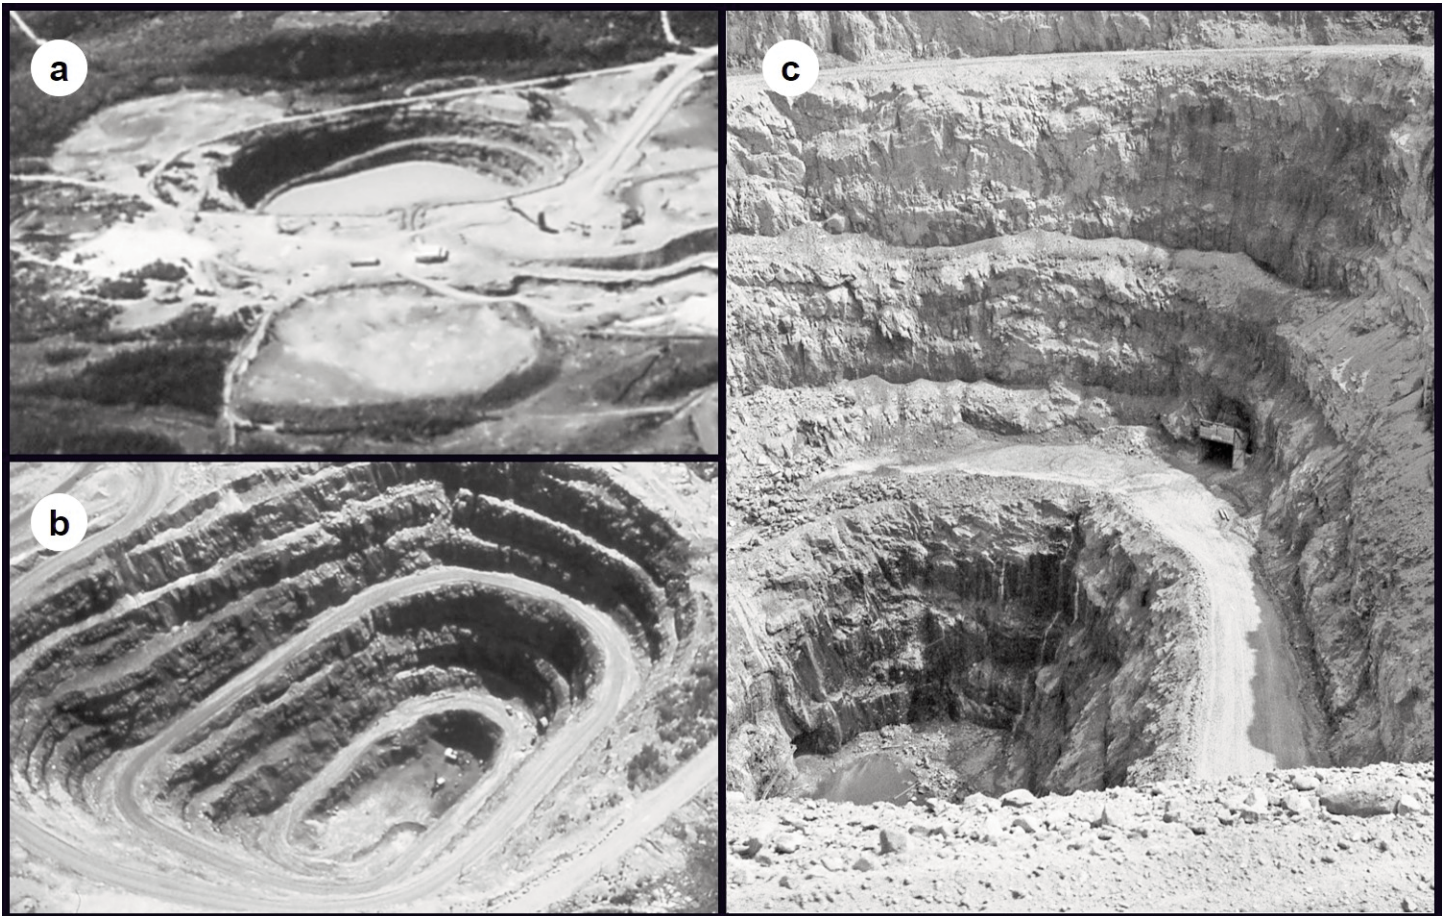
1980s Brunswick No. 6: a) aerial view looking west of No. 6 pit (flooded) in 1989, with waste-rock piles at bottom center and top left (New Brunswick Natural Resources and Energy Development archives); b) aerial view looking southerly into No. 6 pit circa 1980 (Brunswick Mining and Smelting archives); c) ground view looking southerly into No. 6 pit, circa 1980 (courtesy of Ronald Jessulat).
